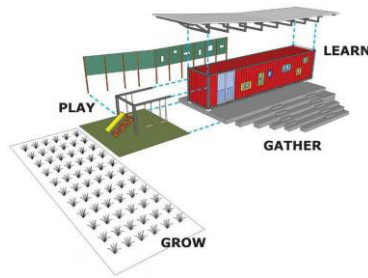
Plan of Building, “Vissershok Container Classroom”, 2013. Digital Photograph (Tsai Design Studio).
